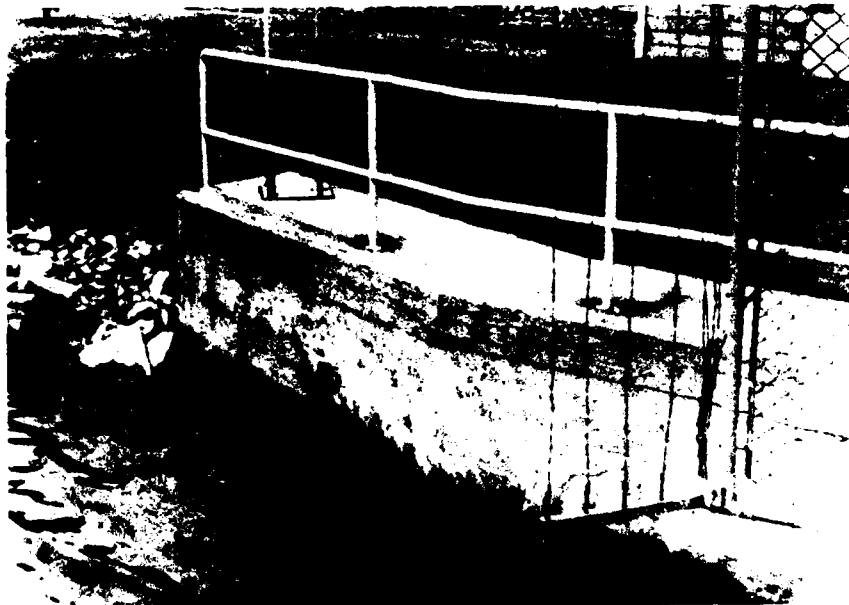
Taken from left spillway, looking at upstream portion of left abutment wall. Resurfaced and original concrete shows evidence of frost damage
